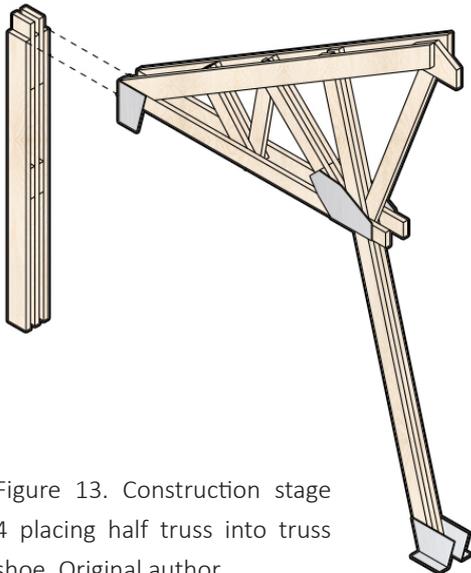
Construction stage 4 placing half truss into truss shoe. Original author
